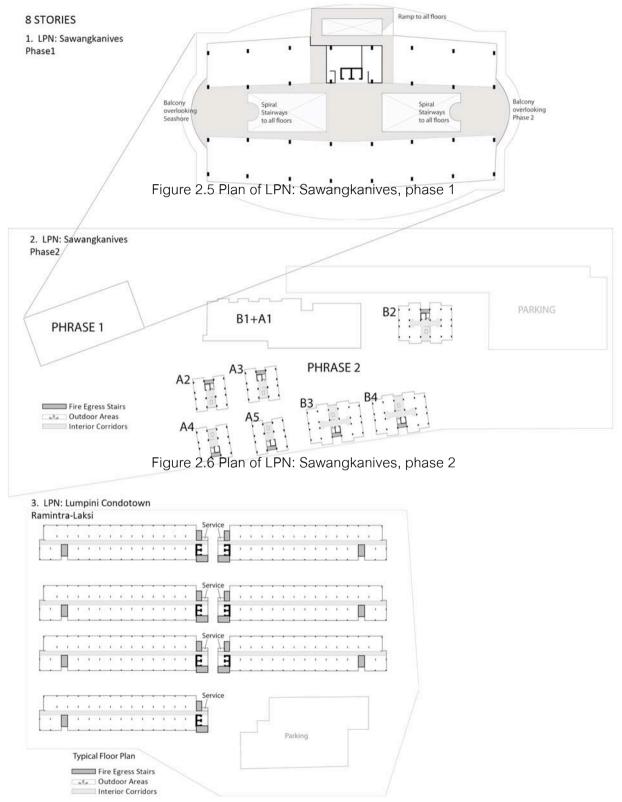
Plan of LPN: Lumpini Condotown, Ramintra-Laksi
